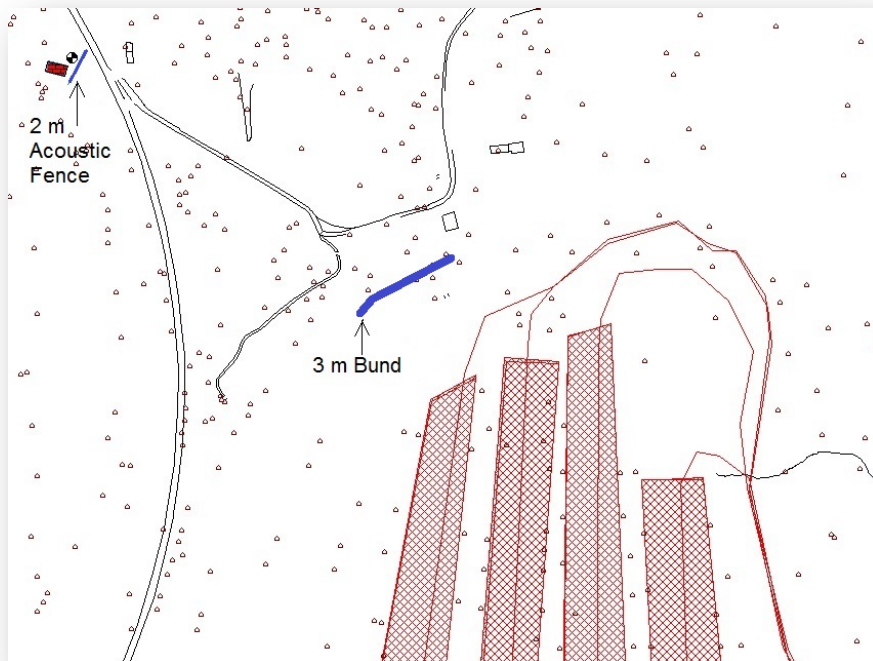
Location of 2 m barrier at Halfway House and 3m bund at edge of working area for Disposition 1B
